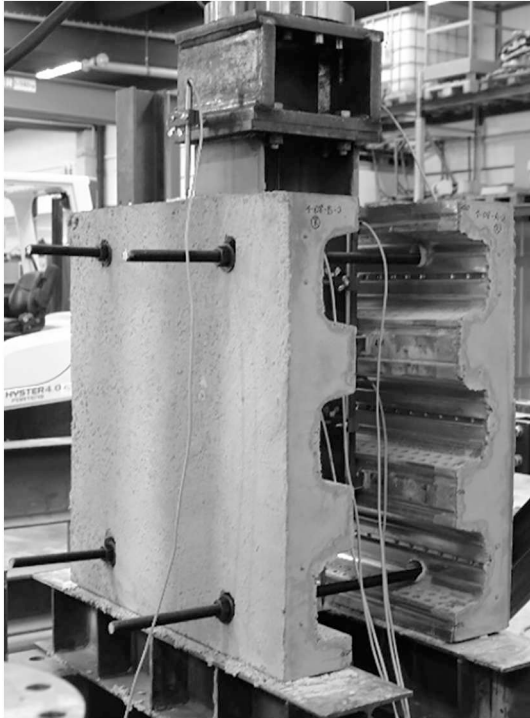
Specimen of DISCOO project using 80 mm deep steel sheeting.
